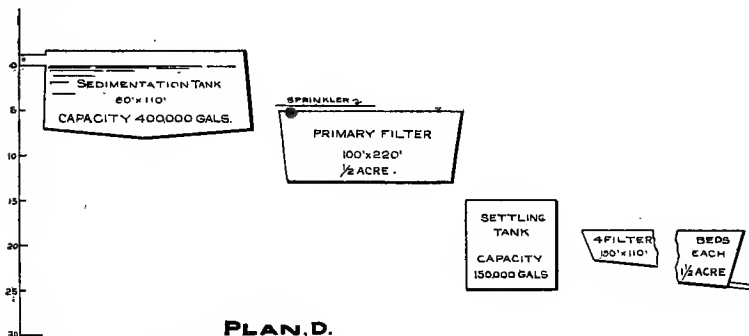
FIG. II. Ideal section showing profile through disposal plant, Plan D, with relative elevations.
